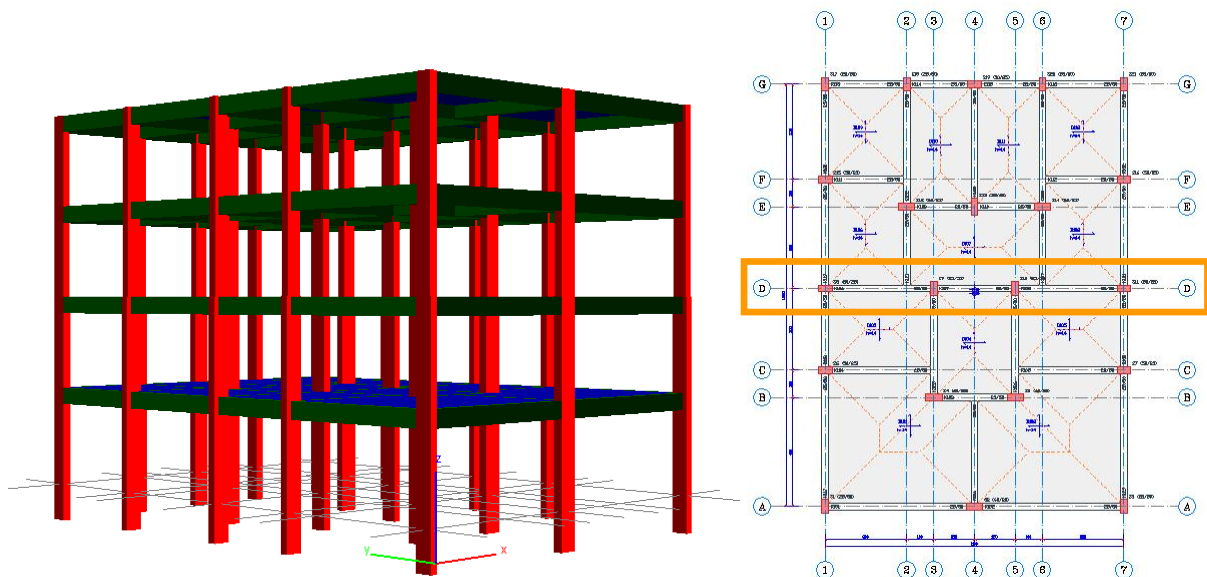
3D model of 4 storey moment resisting frame structure and corresponding plan view
